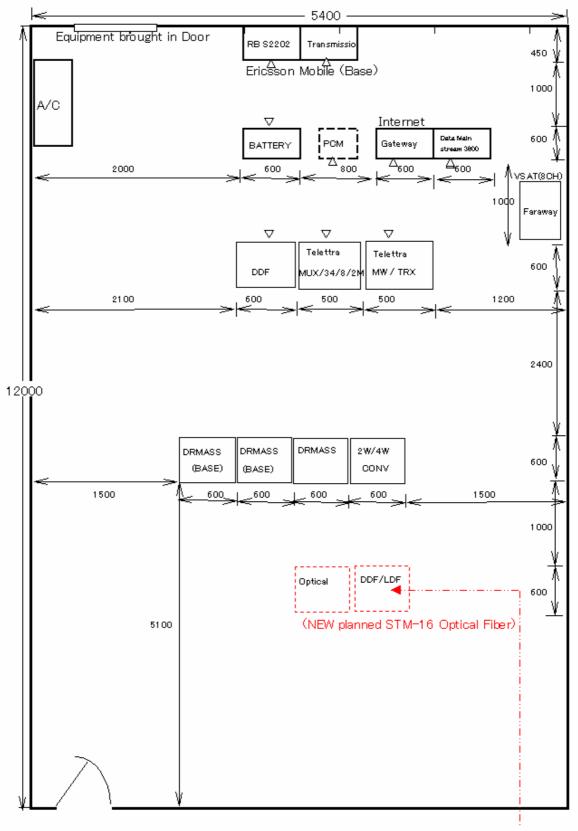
Radio/Mux Room Planned Installation Place (Nazareth P.C.)
